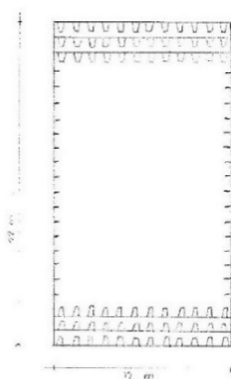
BOX GIRDER CROSS-SECTION
